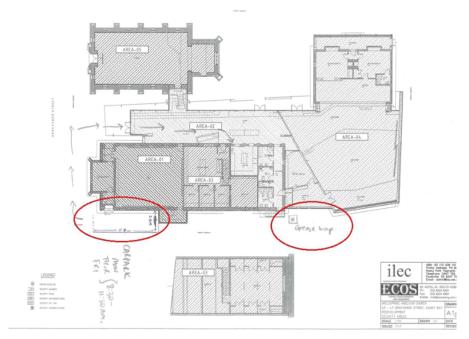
Location of parking space and grease trap (B Wang, 2021)
